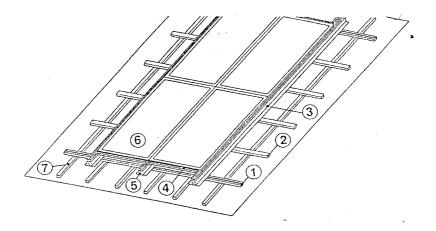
Old example for a construction for the integrated mounting on a slanted roof Legend: 1. C-Profile (steel) 2. tiles slats (Wood) 3. side profile (aluminium) 4. cross section (aluminium) 5. Longitudinal profile (aluminium) 6. PV-Laminate. Source: <Prinz et al. 1992>
